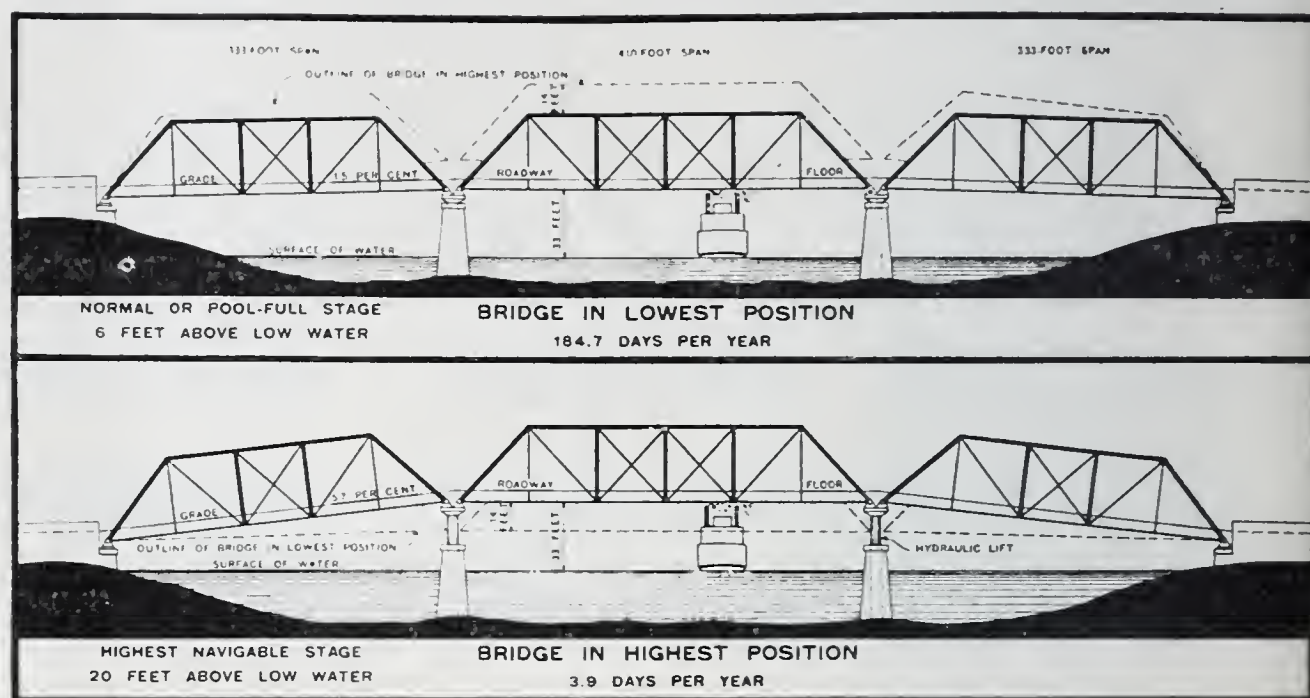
Proposed New Type of Movable Bridge to Span Allegheny River at Pittsburgh.
